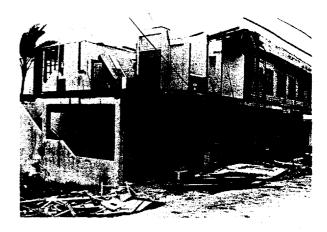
Destruction was widespread in Guam's civilian community. Concrete stuctures fared well, but wooden houses, power lines and the telephone system were all severely damaged. [Official U.S. Navy photograph]
